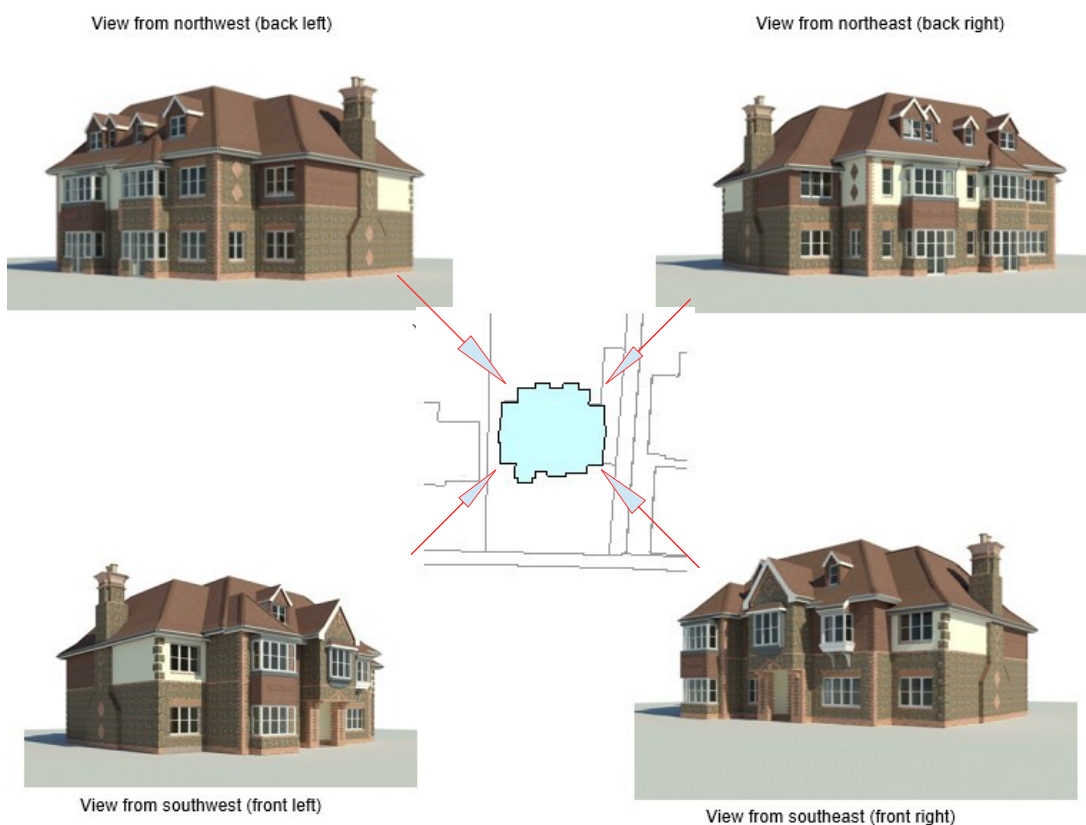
above shows additional features on the sides of the proposed development
